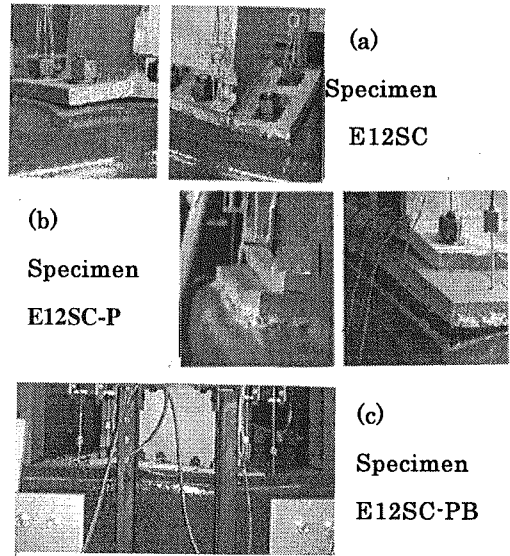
Failure mode of Extended end type connections. at 1/10 of joint rotation
